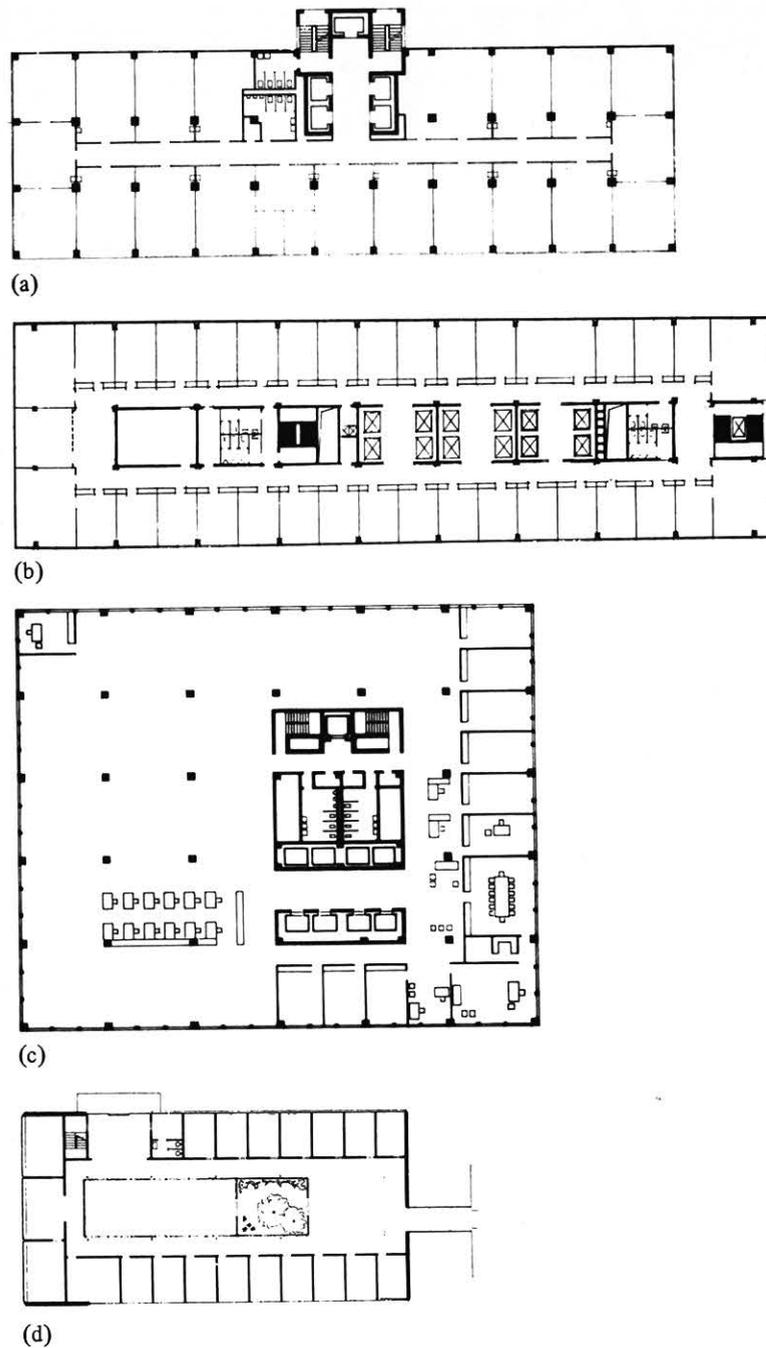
Typical examples of plans of office buildings (from Joedicke, 1962, figures 48, 55, 58, and 62): (a) double-zone layout with central utility core—Equitable Savings and Loan Association building, Portland, Oregon (Pietro Belluschi); (b) triple-zone layout with parallel corridors—competition design for Phönix-Rheinrohr AG building, Düsseldorf (Paul Schaeffer-Heyrothsberge); (c) open layout with internal utility core—Mile High Center, Denver (I M Pei); (d) single-storey courtyard layout—Schlumberger building, Ridgefield, Connecticut (Philip Johnson).
